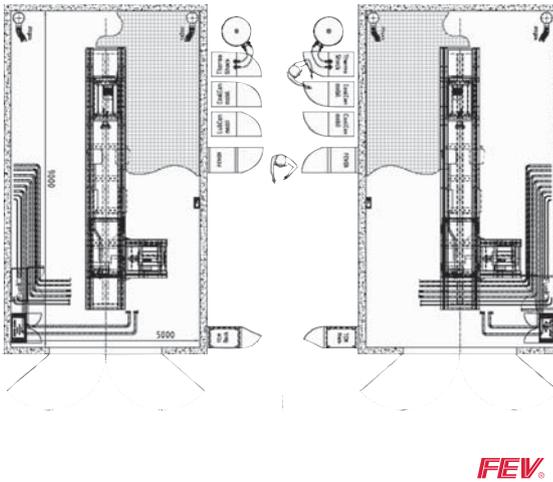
Floor Plan of an Engine Test Bench, Variable for Longitudinal and Transversal Installation
